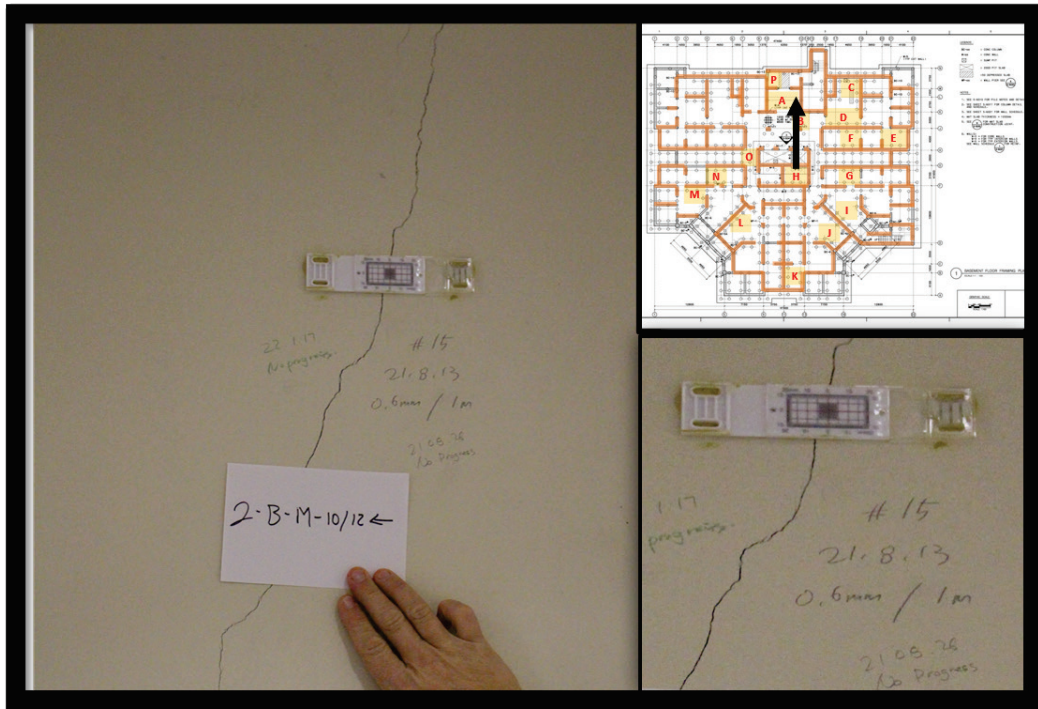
Typical observed vertical cracking within the Tower 2 basement storage area (Section I of the floorplan insert). The widest area of the observed crack was less than 0.40 mm and did not intersect the floor slab (crack gauge insert).
